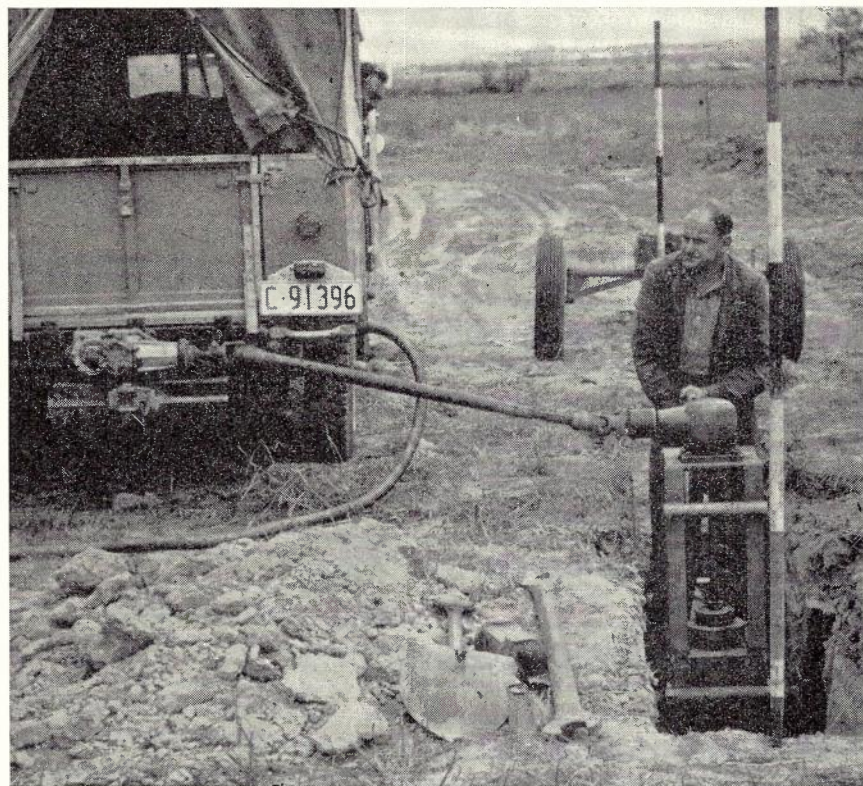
Proline Horizontal Borer showing Drive from P.T.O. of Land Rover.
